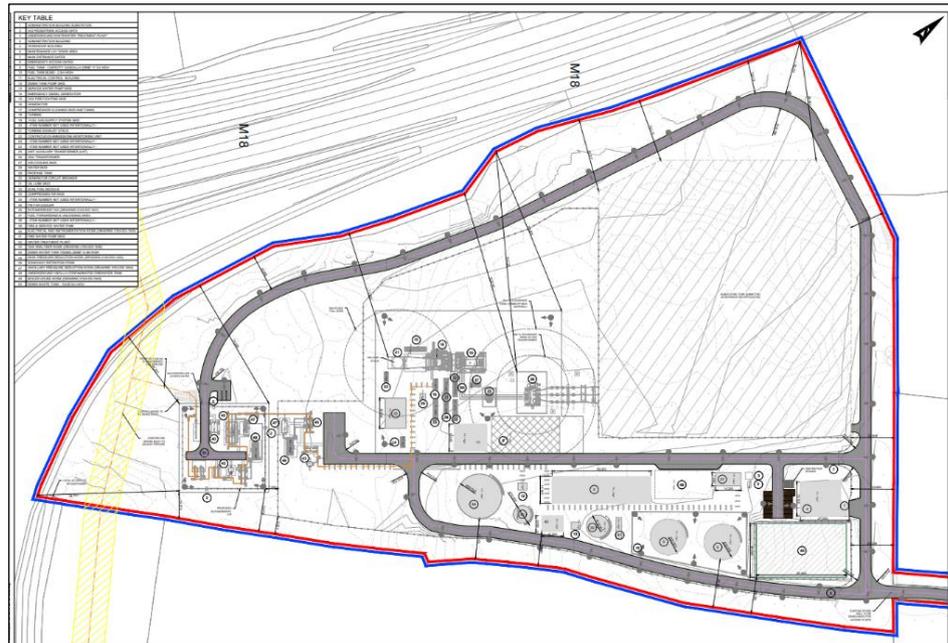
Extract of Site Layout Plan excluding access track and new entrance
